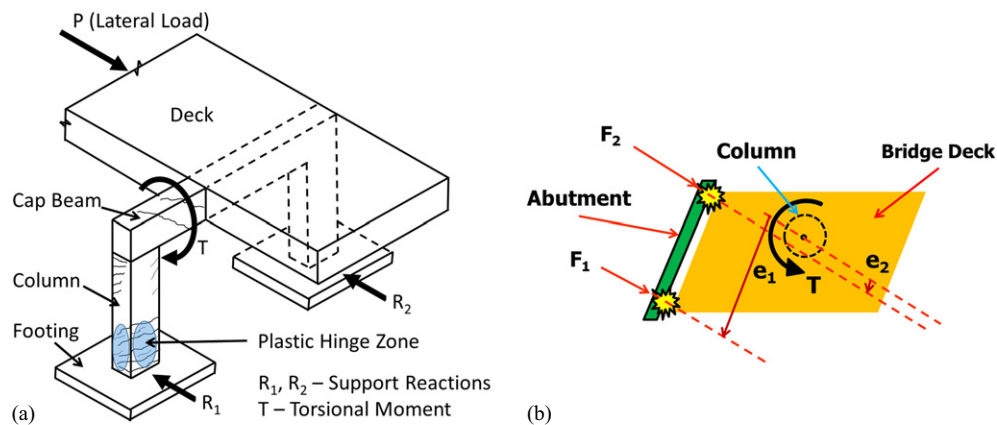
Torsion in bridge structures: (a) outrigger bent; (b) skew bridge deck
